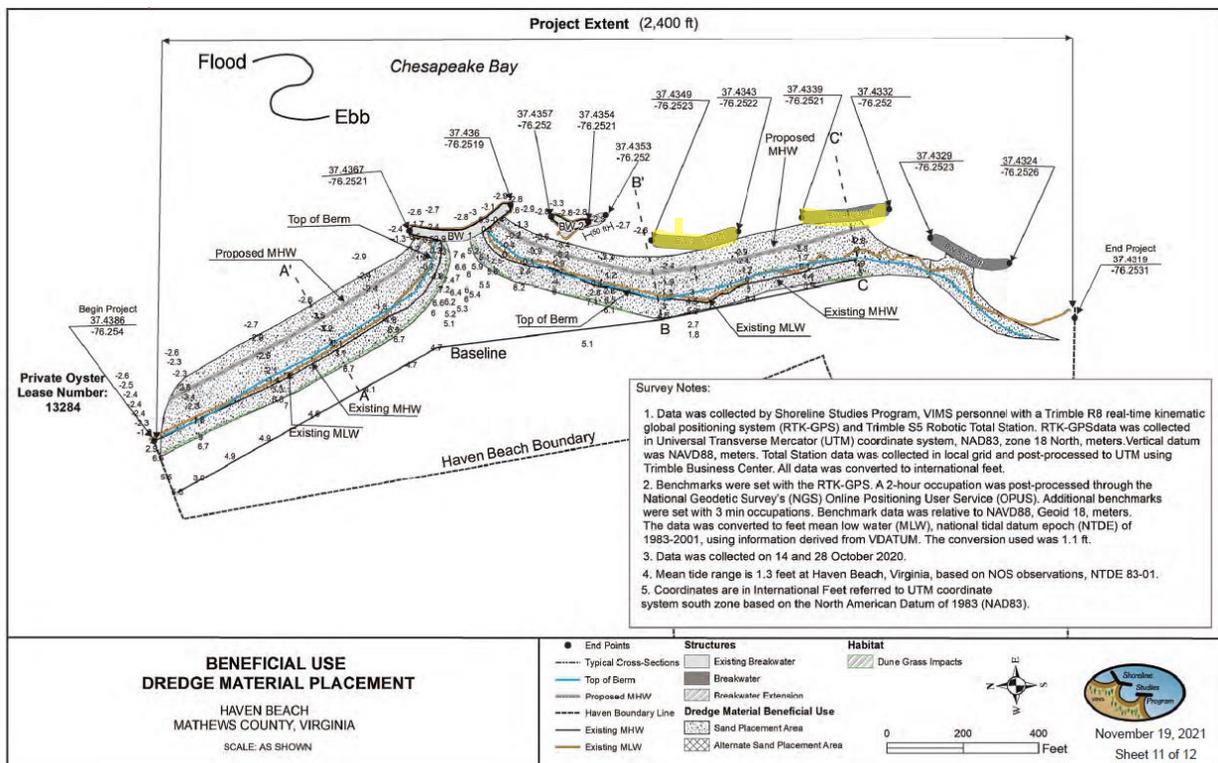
Living shoreline design at Haven Beach. Funding is being requested for construction of BW-3 and BW-4 which are rock breakwaters permitted for 230 linear feet each. BW-3 and BW-4 are highlighted in yellow.
